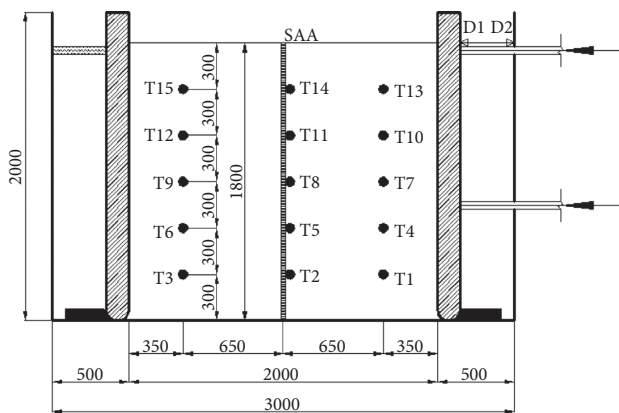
Arrangement of sensors embedded in observation section for quasistatic test (units: mm) (D: LVDT; T: earth pressure cell; SAA: shape acceleration array).
